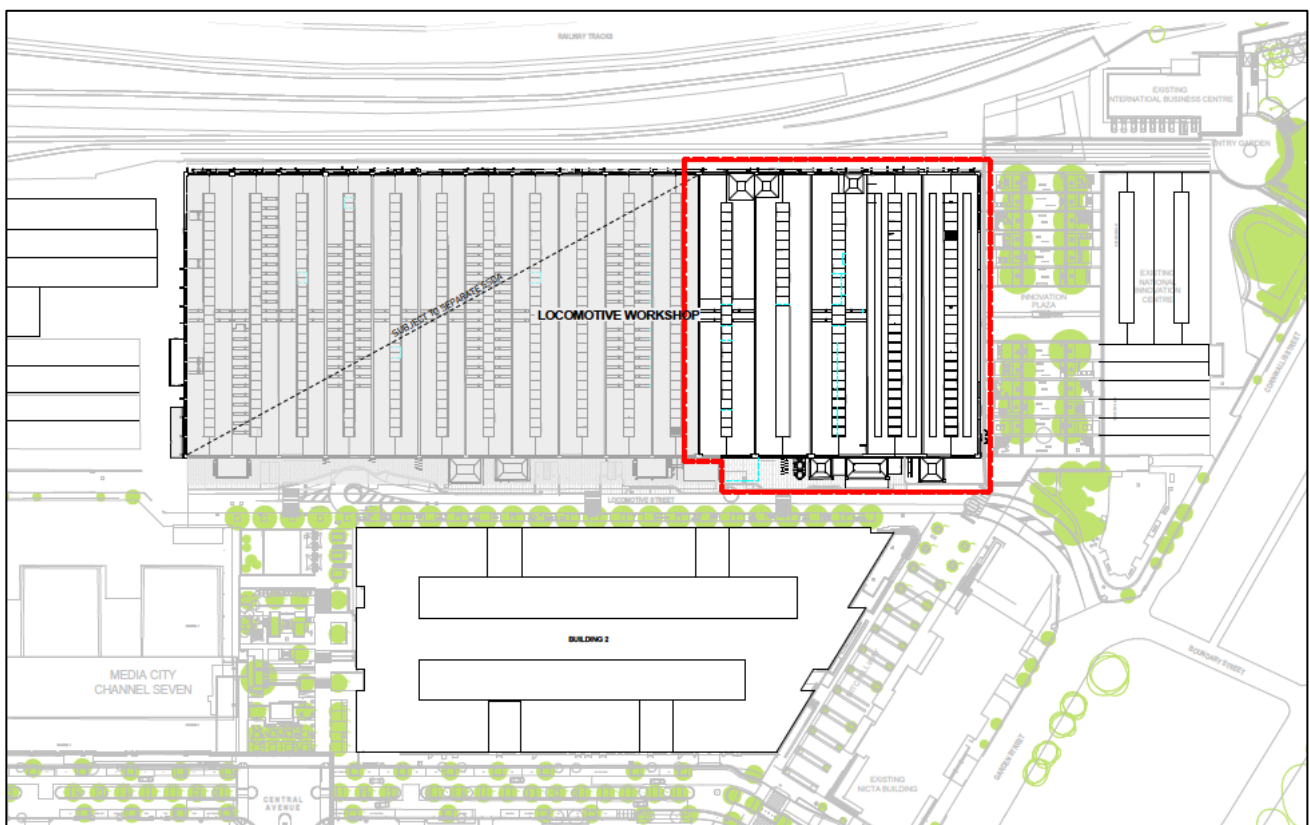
PROPOSED SITE PLAN, LOCOMOTIVE WORKSHOP BAYS 1-4A (SOURCE: SISSONS ARCHITECTS, DRAWING SA-AR-DWG BB-B4-0302[G], 27.10.17)
